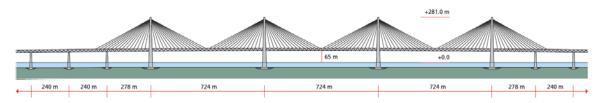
Lengthwise profile of the cable-stayed bridge solution
